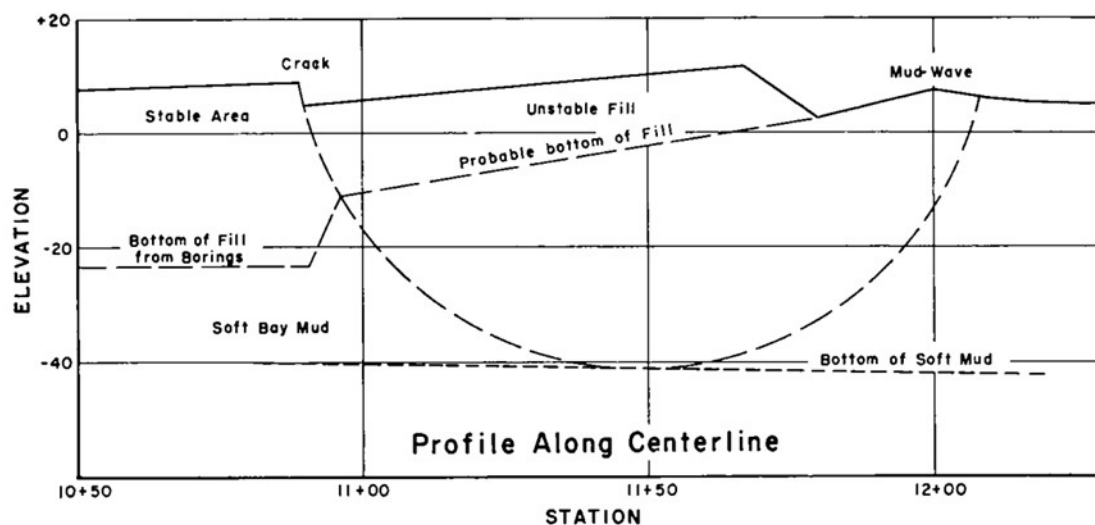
Example of Fill Failure due to Instability and Mud Wave Formation
